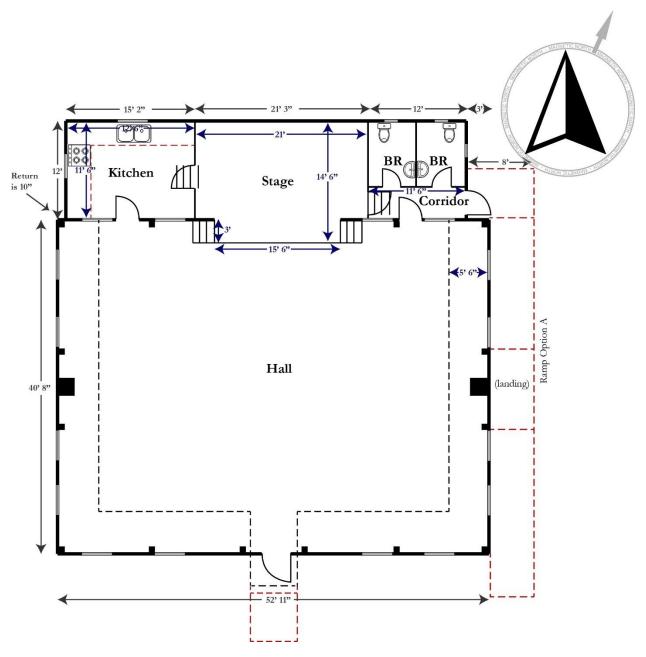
Conceptual floor plan illustrating recommendations (not to scale).
